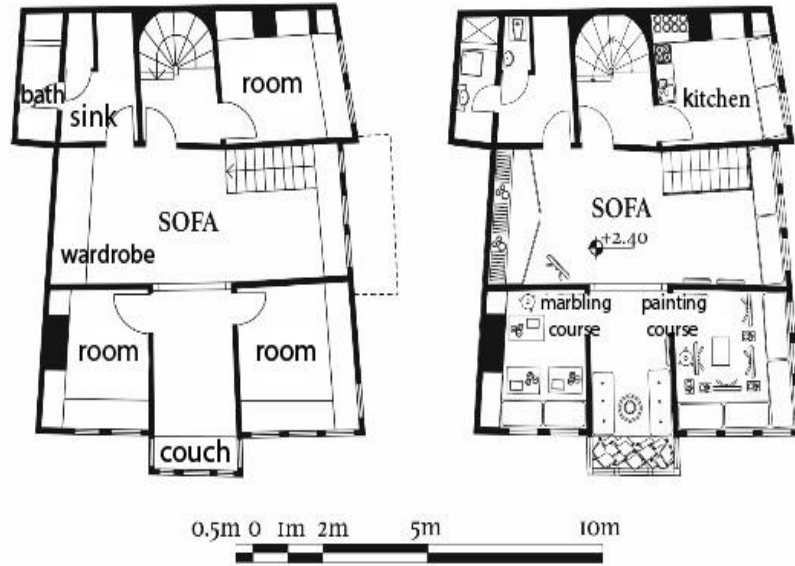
Ground and first floor plans /Fenerli house (measured restoration)
